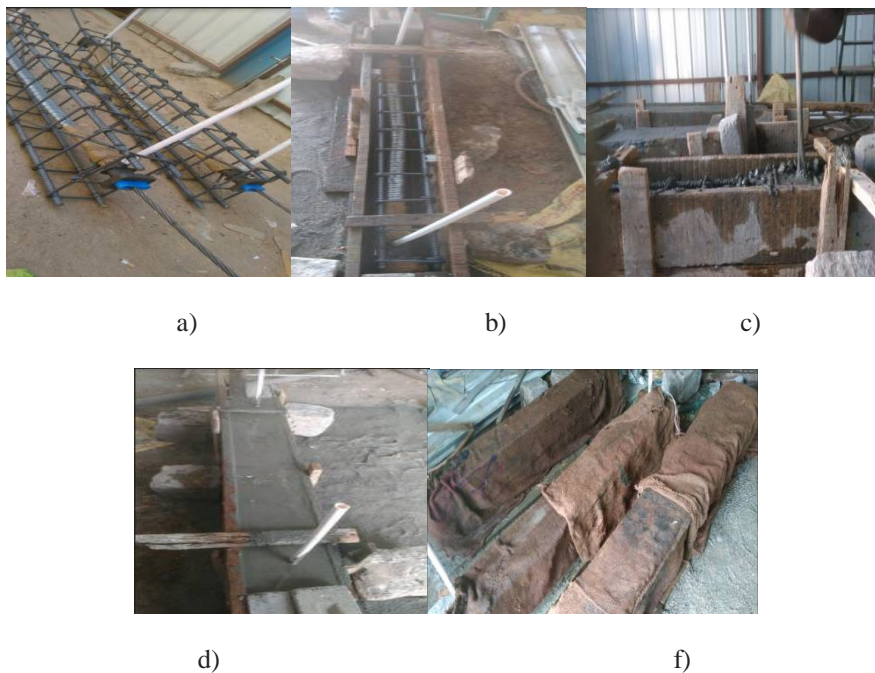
(a) reinforcing beam (b) shuttering beam(c) compaction (d) Concreting beam (e) Curing beam
